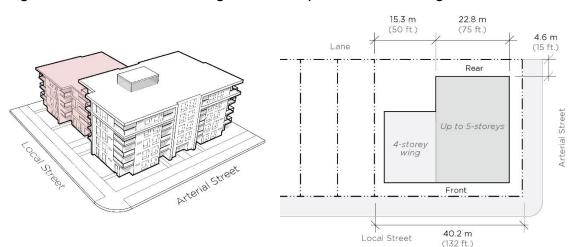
Illustration of a flanking corner site apartment with a wing extension
